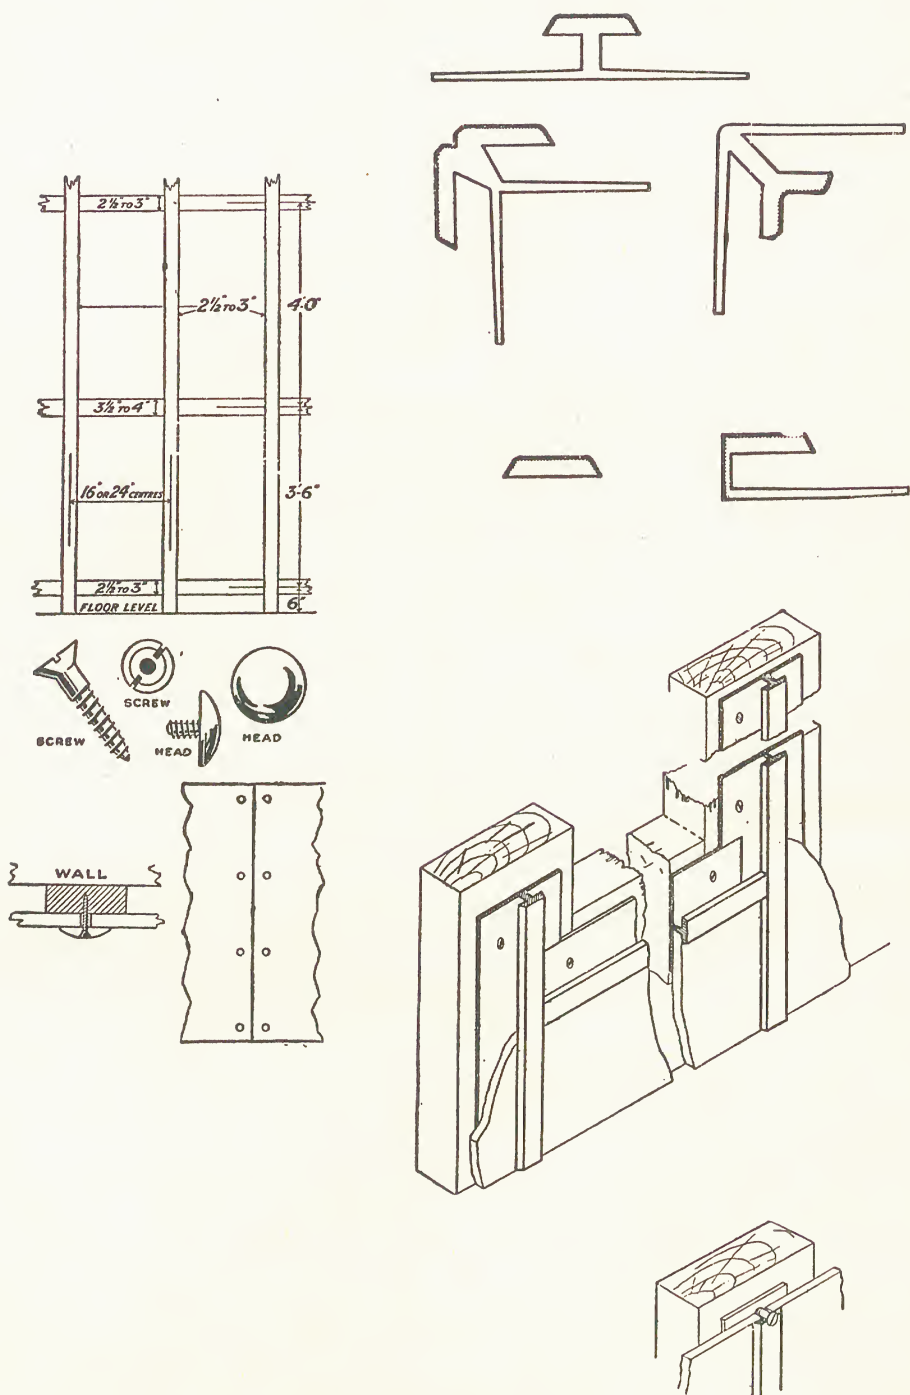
Fixing methods for decorated asbestos sheets. (Left) Fixing to wood battens (Right) Fixing with aluminium-alloy sections.
